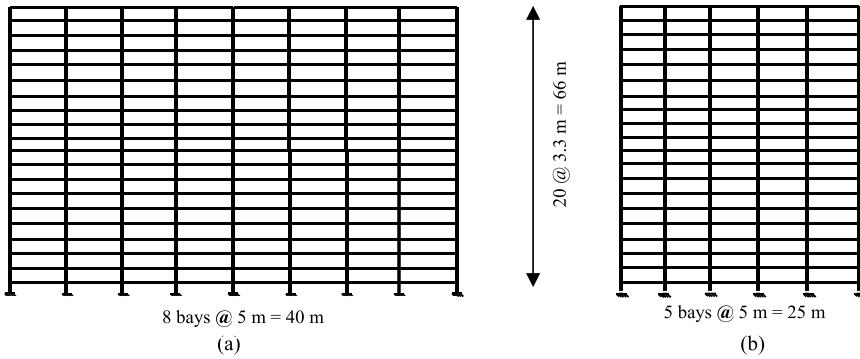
a Front view of XX direction frame. b Front view of YY direction frame
